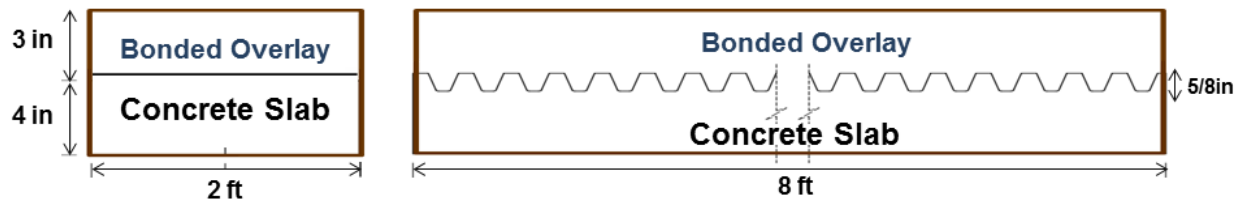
Schematic illustration of the bonded LMC overlay on a base of concrete slab.
